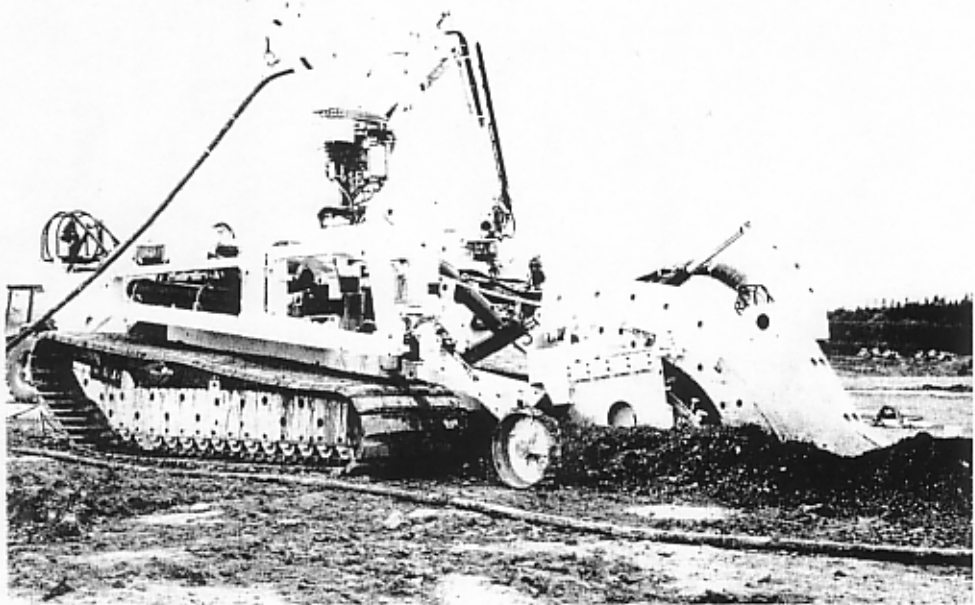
Soil Machine Dynamics Ltd, Bottom Crawling Cable Burial ROV
